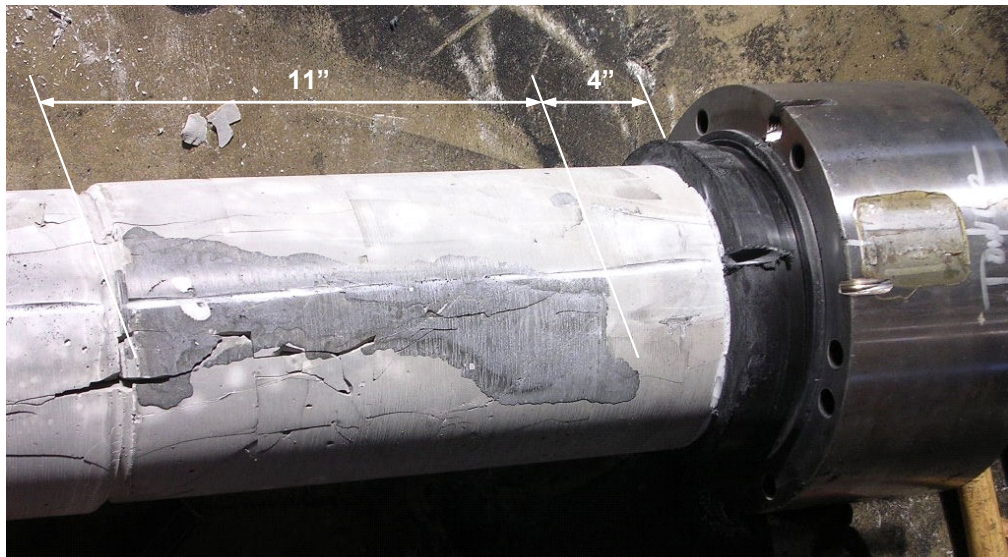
Grout lens at tower anchorage - Specimen 9
